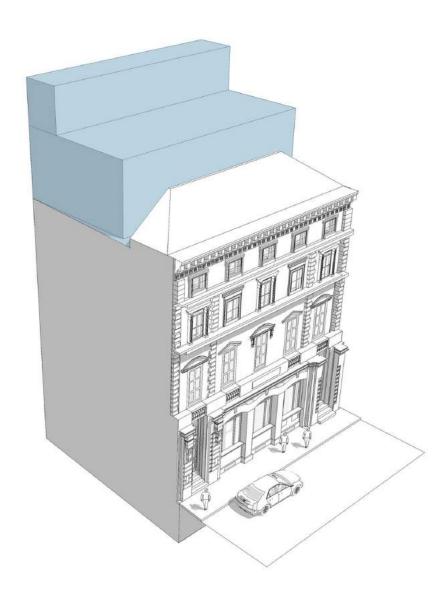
Three storey new build extension set back from existing roof – minimal visual impact from street level
